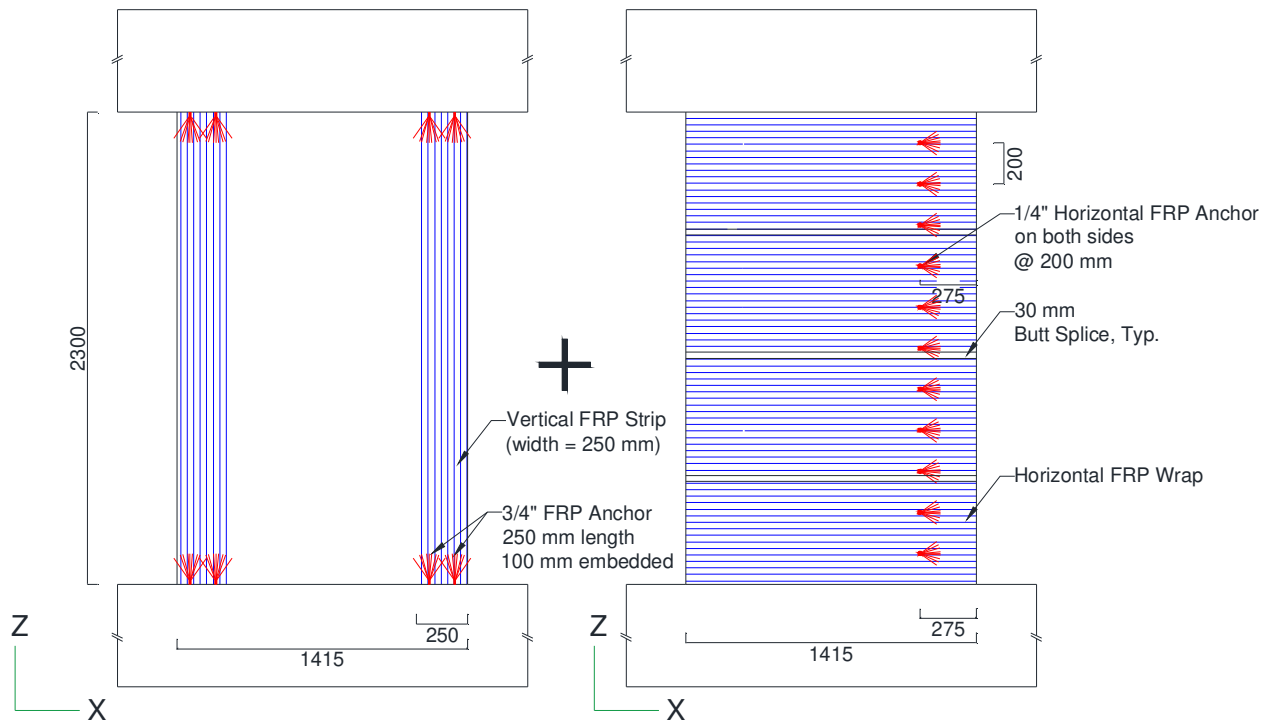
Elevation view of the retrofitting scheme of the C-shaped wall
